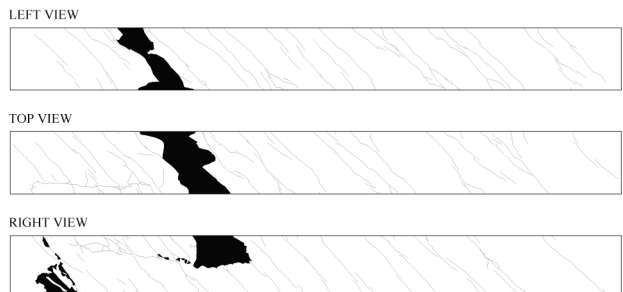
Cracking pattern: Beam E-0.78-5.5-0
